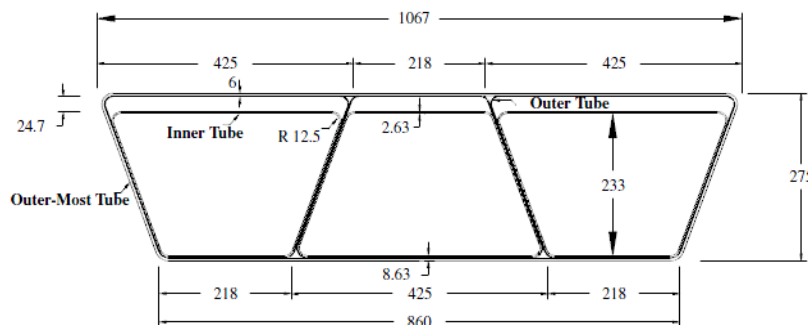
Cross-section of hybrid FRP-concrete deck developed by (Alnahhal & Aref, 2008)
